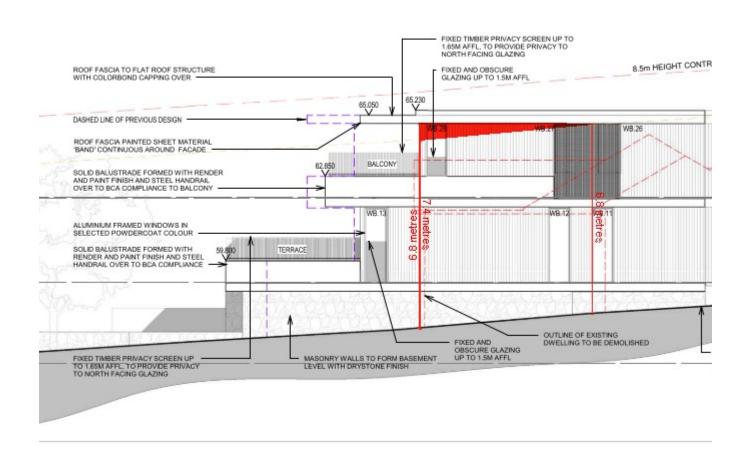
27A Alan western elevation showing area of wall height non-compliance.
